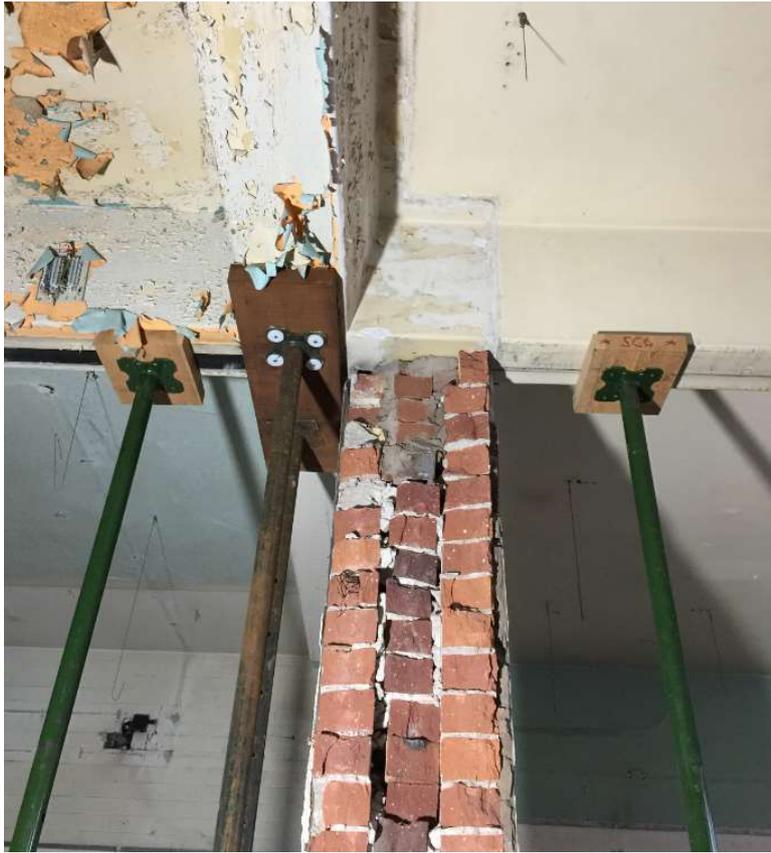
Existing masonry pier with temporary props - appeared to be non-loadbearing TBC
